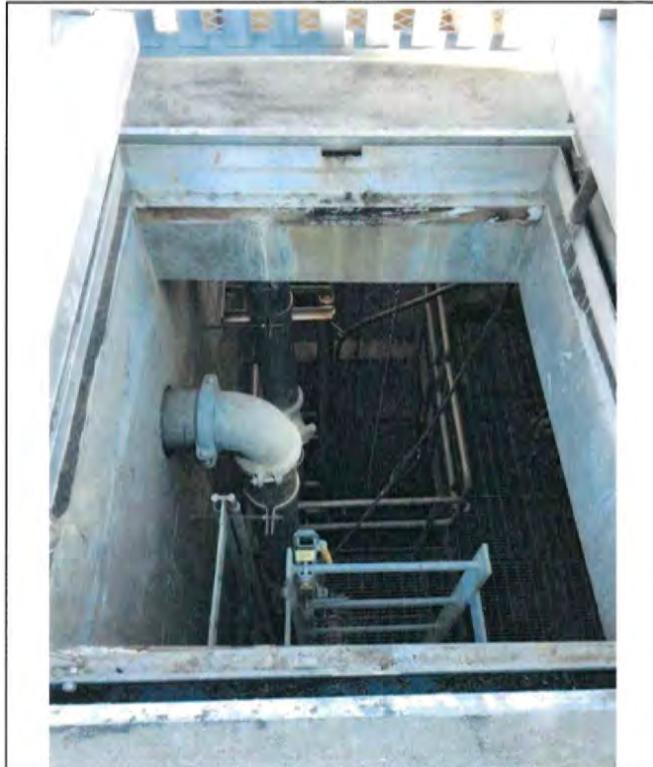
Interior, Hillcrest Pump Station Wet Well, December 2016
